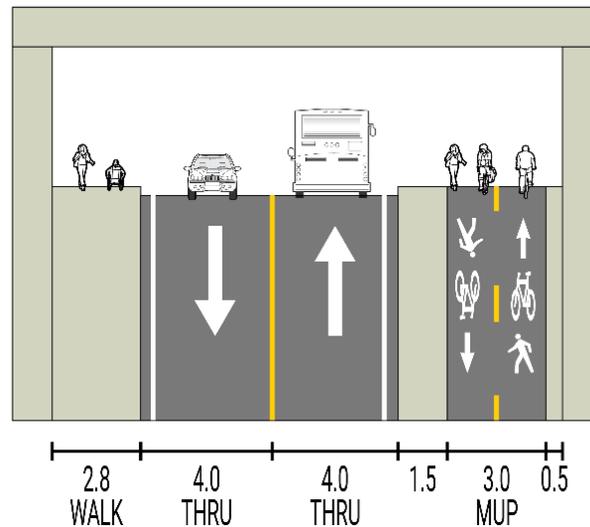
Near-term cross section at the Highway 102 underpass for multi-use pathway on one side alternative
